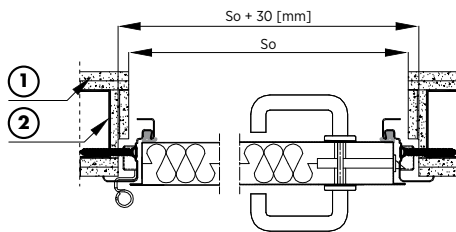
Installation of the double-leaf door with the corner frame in a masonry wall, vertical cross-section
